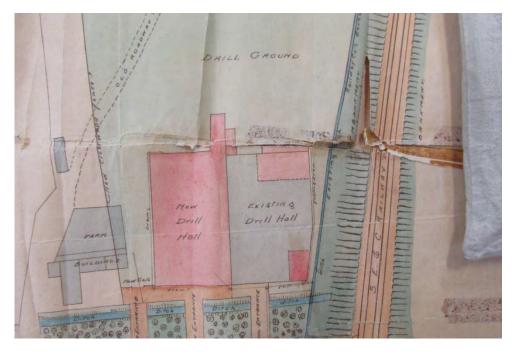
Plans of the new and existing drill hall in their wider context. Copyright The East Sussex Record Office
